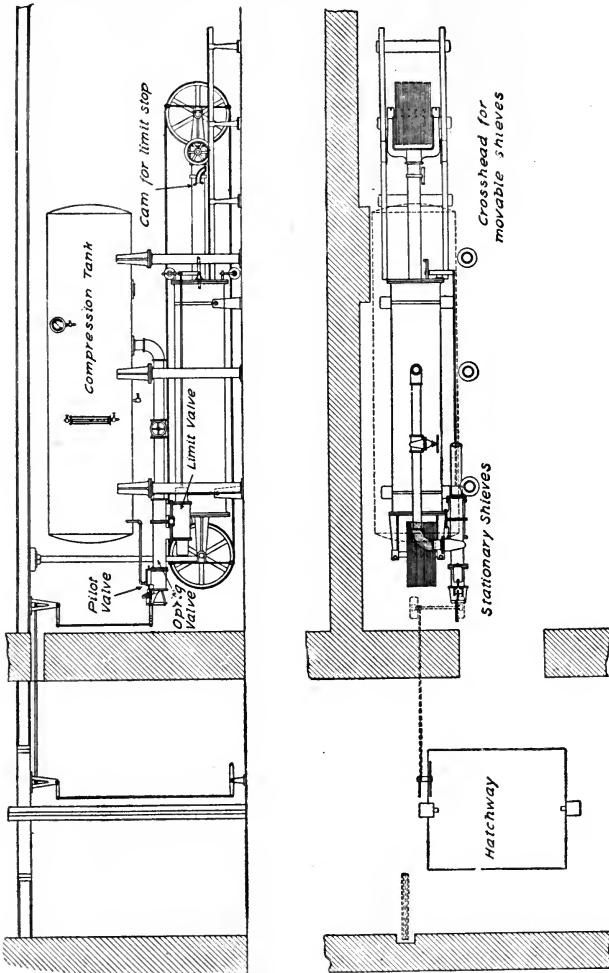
Plan and Elevation of Horizontal Hydraulic Elevator.
